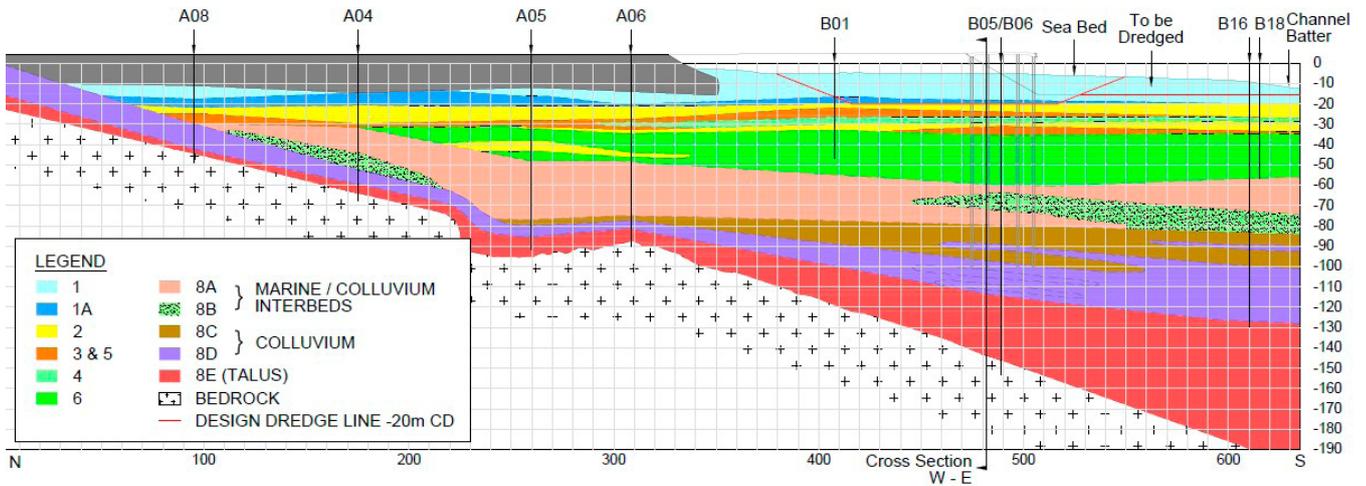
North-South cross section showing existing reclamation, proposed wharf and Te Bay geology
